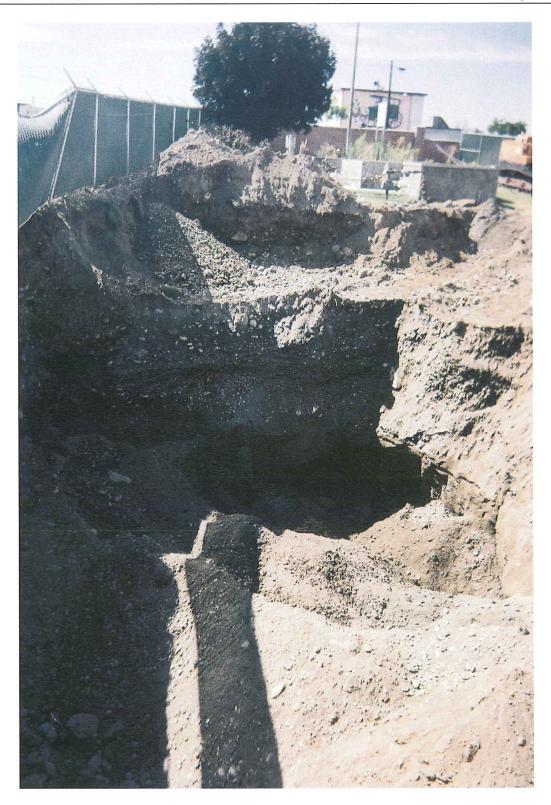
LOOKING WEST ACROSS FINAL EXCAVATION
